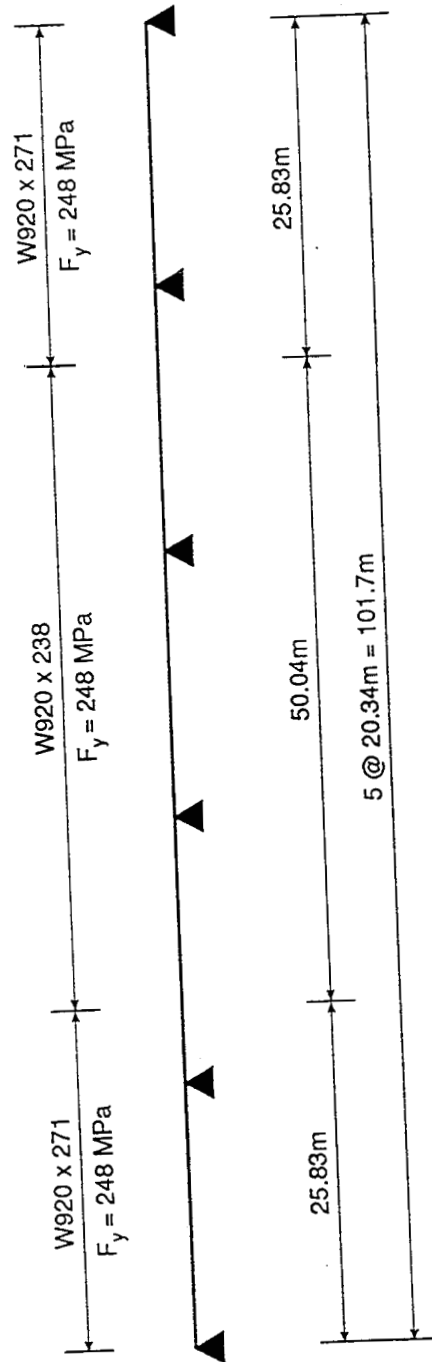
Girder Details for the 5-Span Continuous Bridge
